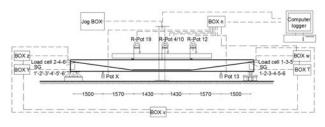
Acquisition scheme – Simply supported beam and draped tendons
